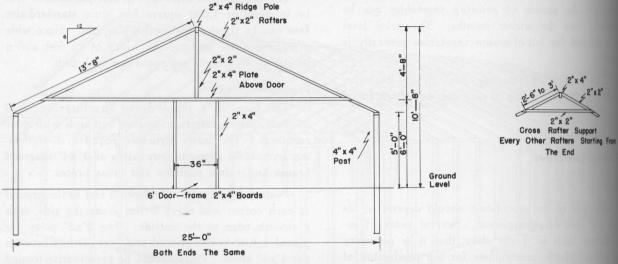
The cross section showing framing and bracing details. Have large doors in one end to move heavy equipment and supplies in and out of the house. Two ridgepole supports, equal distance apart from either end are required on a 40-foot house.
